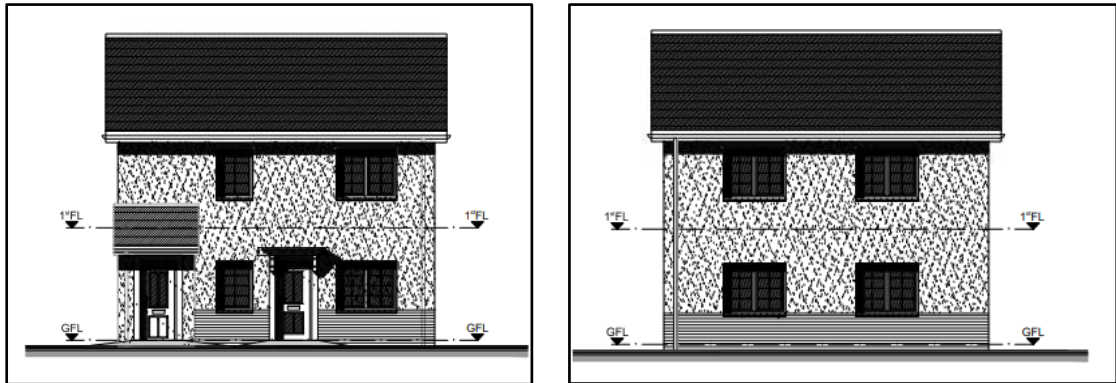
Elevations Proposed Blocks 7, 9 and 12
